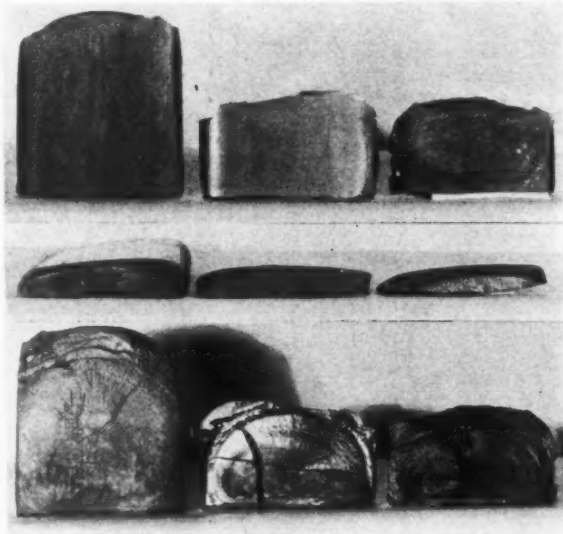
The Top Faces, Ends and Fracture Faces of Three Sizable Rail End Chips
